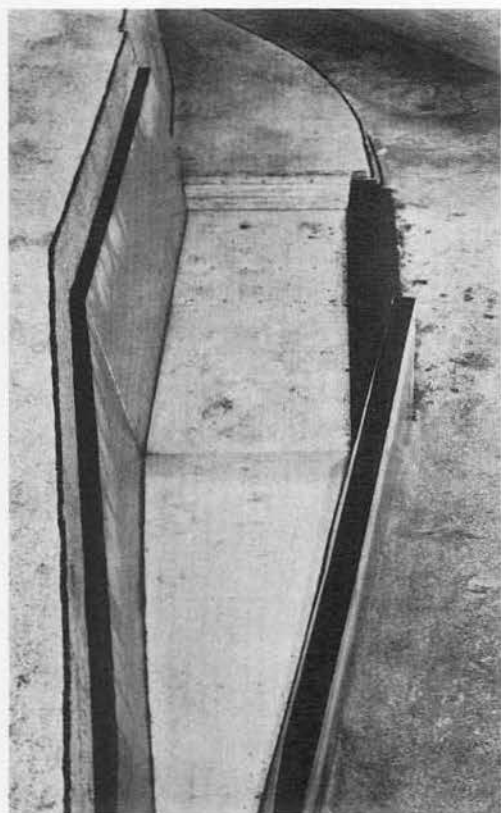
Right training wall shortened 108 ft to sta 1+17.0
